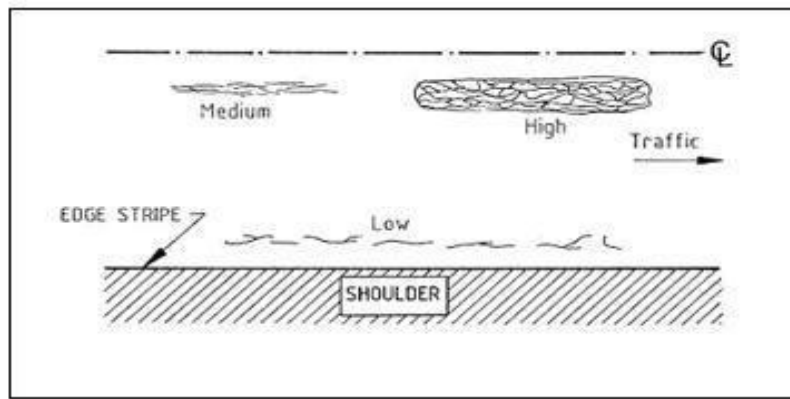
Longitudinal and Transverse Cracks (GTC, 1998)
